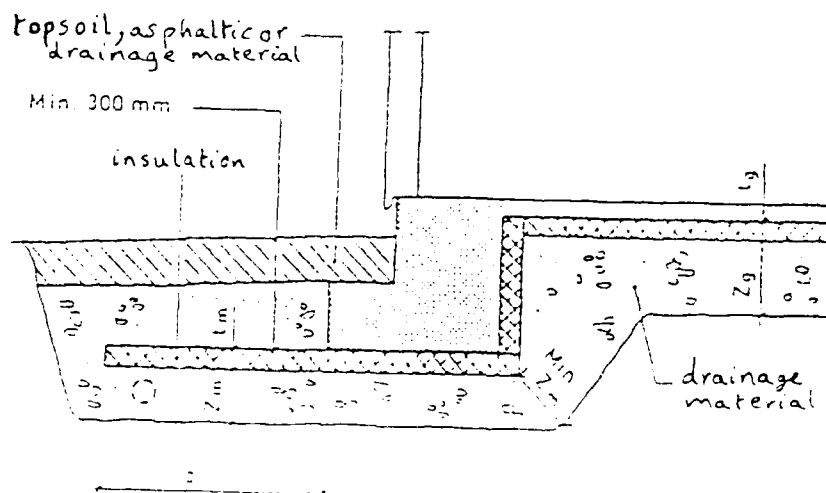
Frost protection : Foundation for large loading. Inside formwork.
